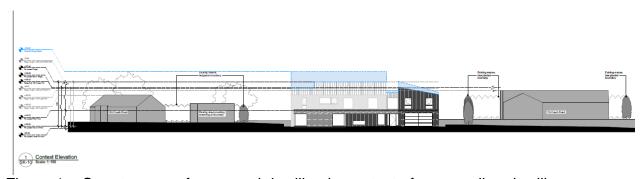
Street scene of proposed dwelling in context of surrounding dwellings
